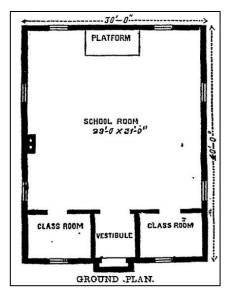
Prospective one-room schoolhouse floorplan (*The Canada Farmer*, Vol. 3, no. 12, p.189)
